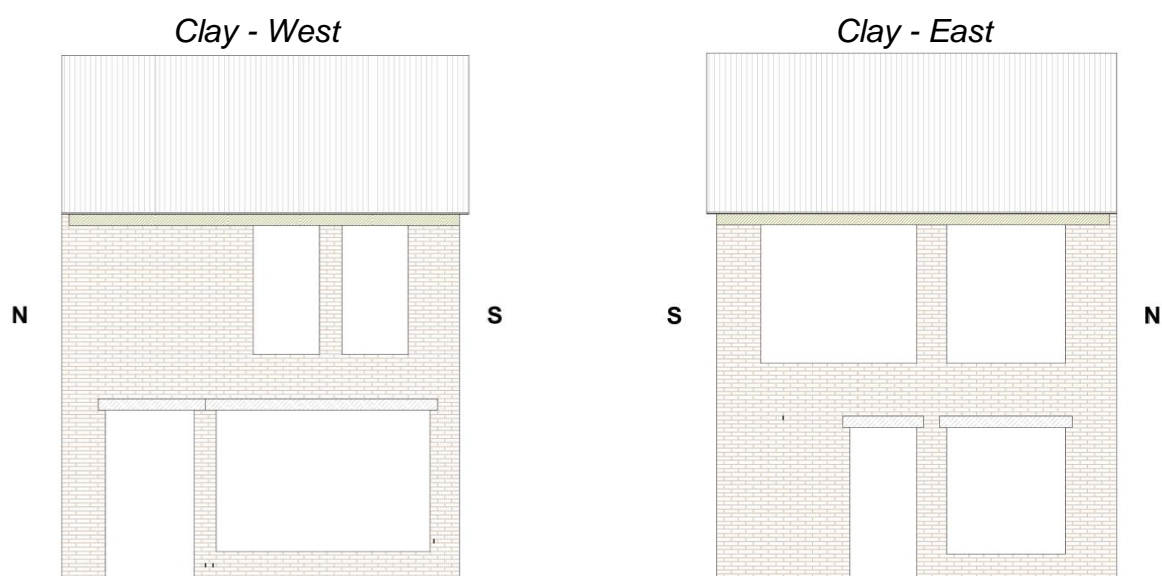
EQ-NPR 33% cracks – West and East clay façades.
